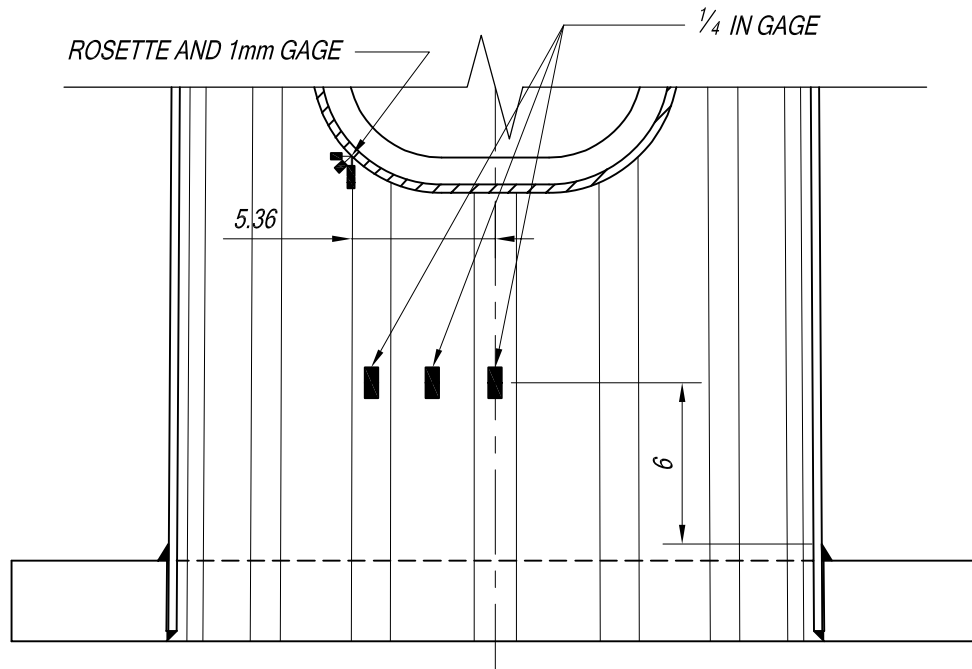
Type X specimen extensively instrumented specimen strain gage plan, interior
